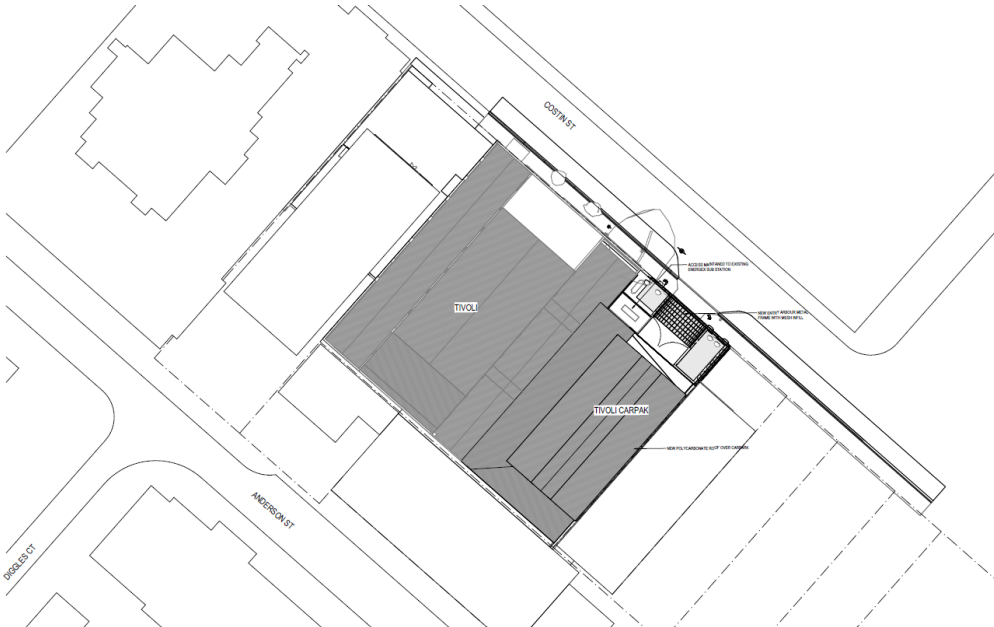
Proposed Site Plan (Source: JDA Co.) – refer attached PDF for full drawing
